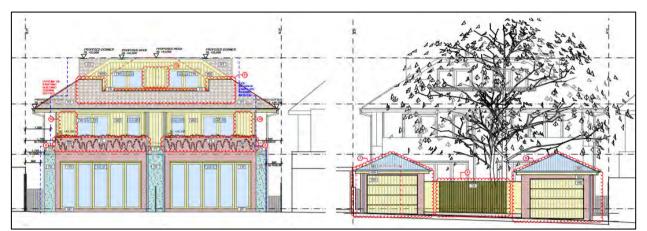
Proposed western elevations (Cremorne Laneway, right).
